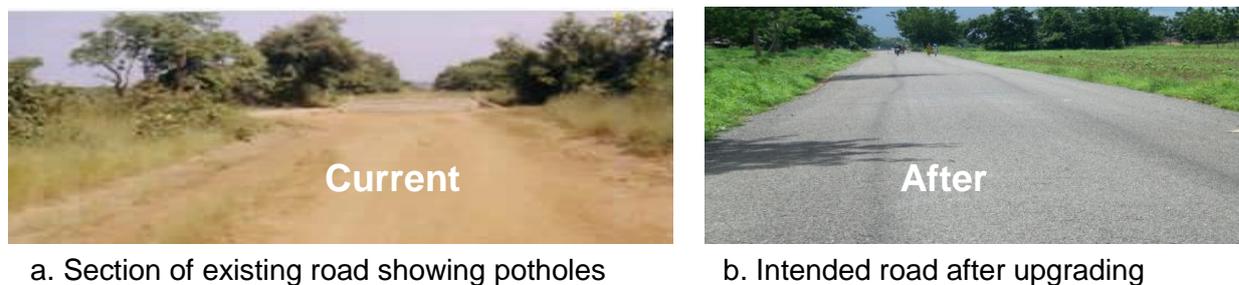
Sample of existing roads (a) and the intended road after construction (b). “b” is a section of the 3-kilometre road constructed near the Saboba township
